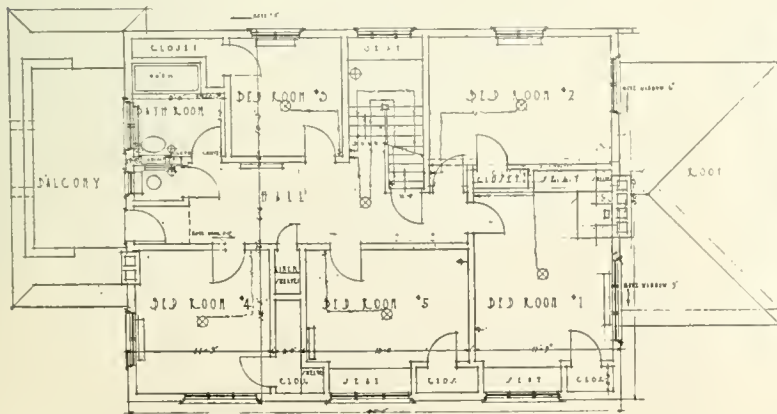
Bedroom floor of house shown in Fig. 9.
